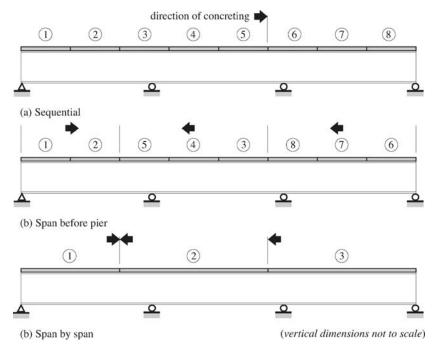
Schematic of concreting stages for a slab that is cast in-situ.
